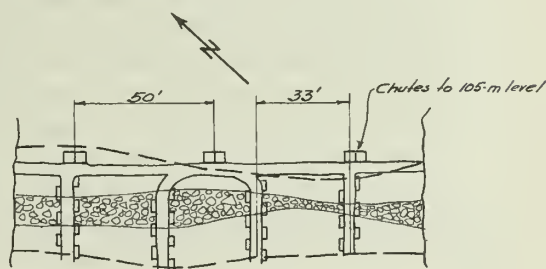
Typical hand-tramming caving level, 65-meter level, Pilar orebody. Crosscuts solidly timbered, with drawing chutes on both sides in alternate sets
